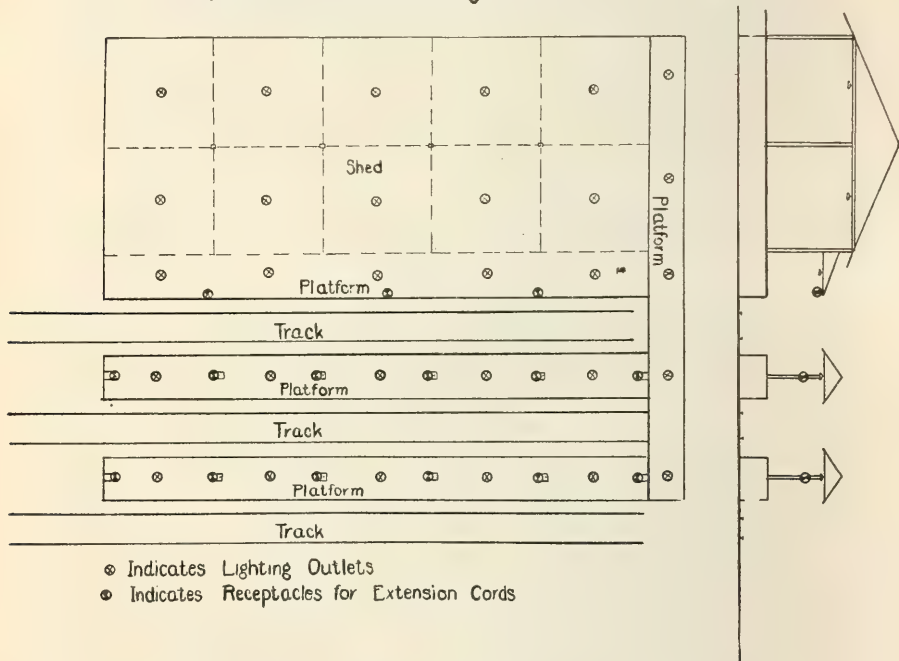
Diagram of lighting layout, typical transfer platforms.
